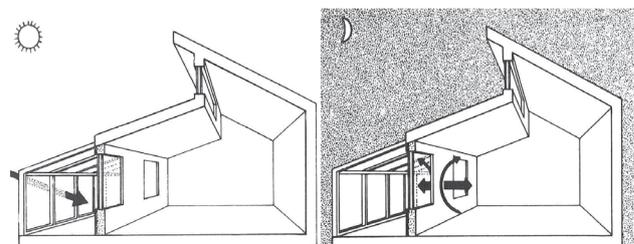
Working principle of solar rooms (Alparslan, 2010)
